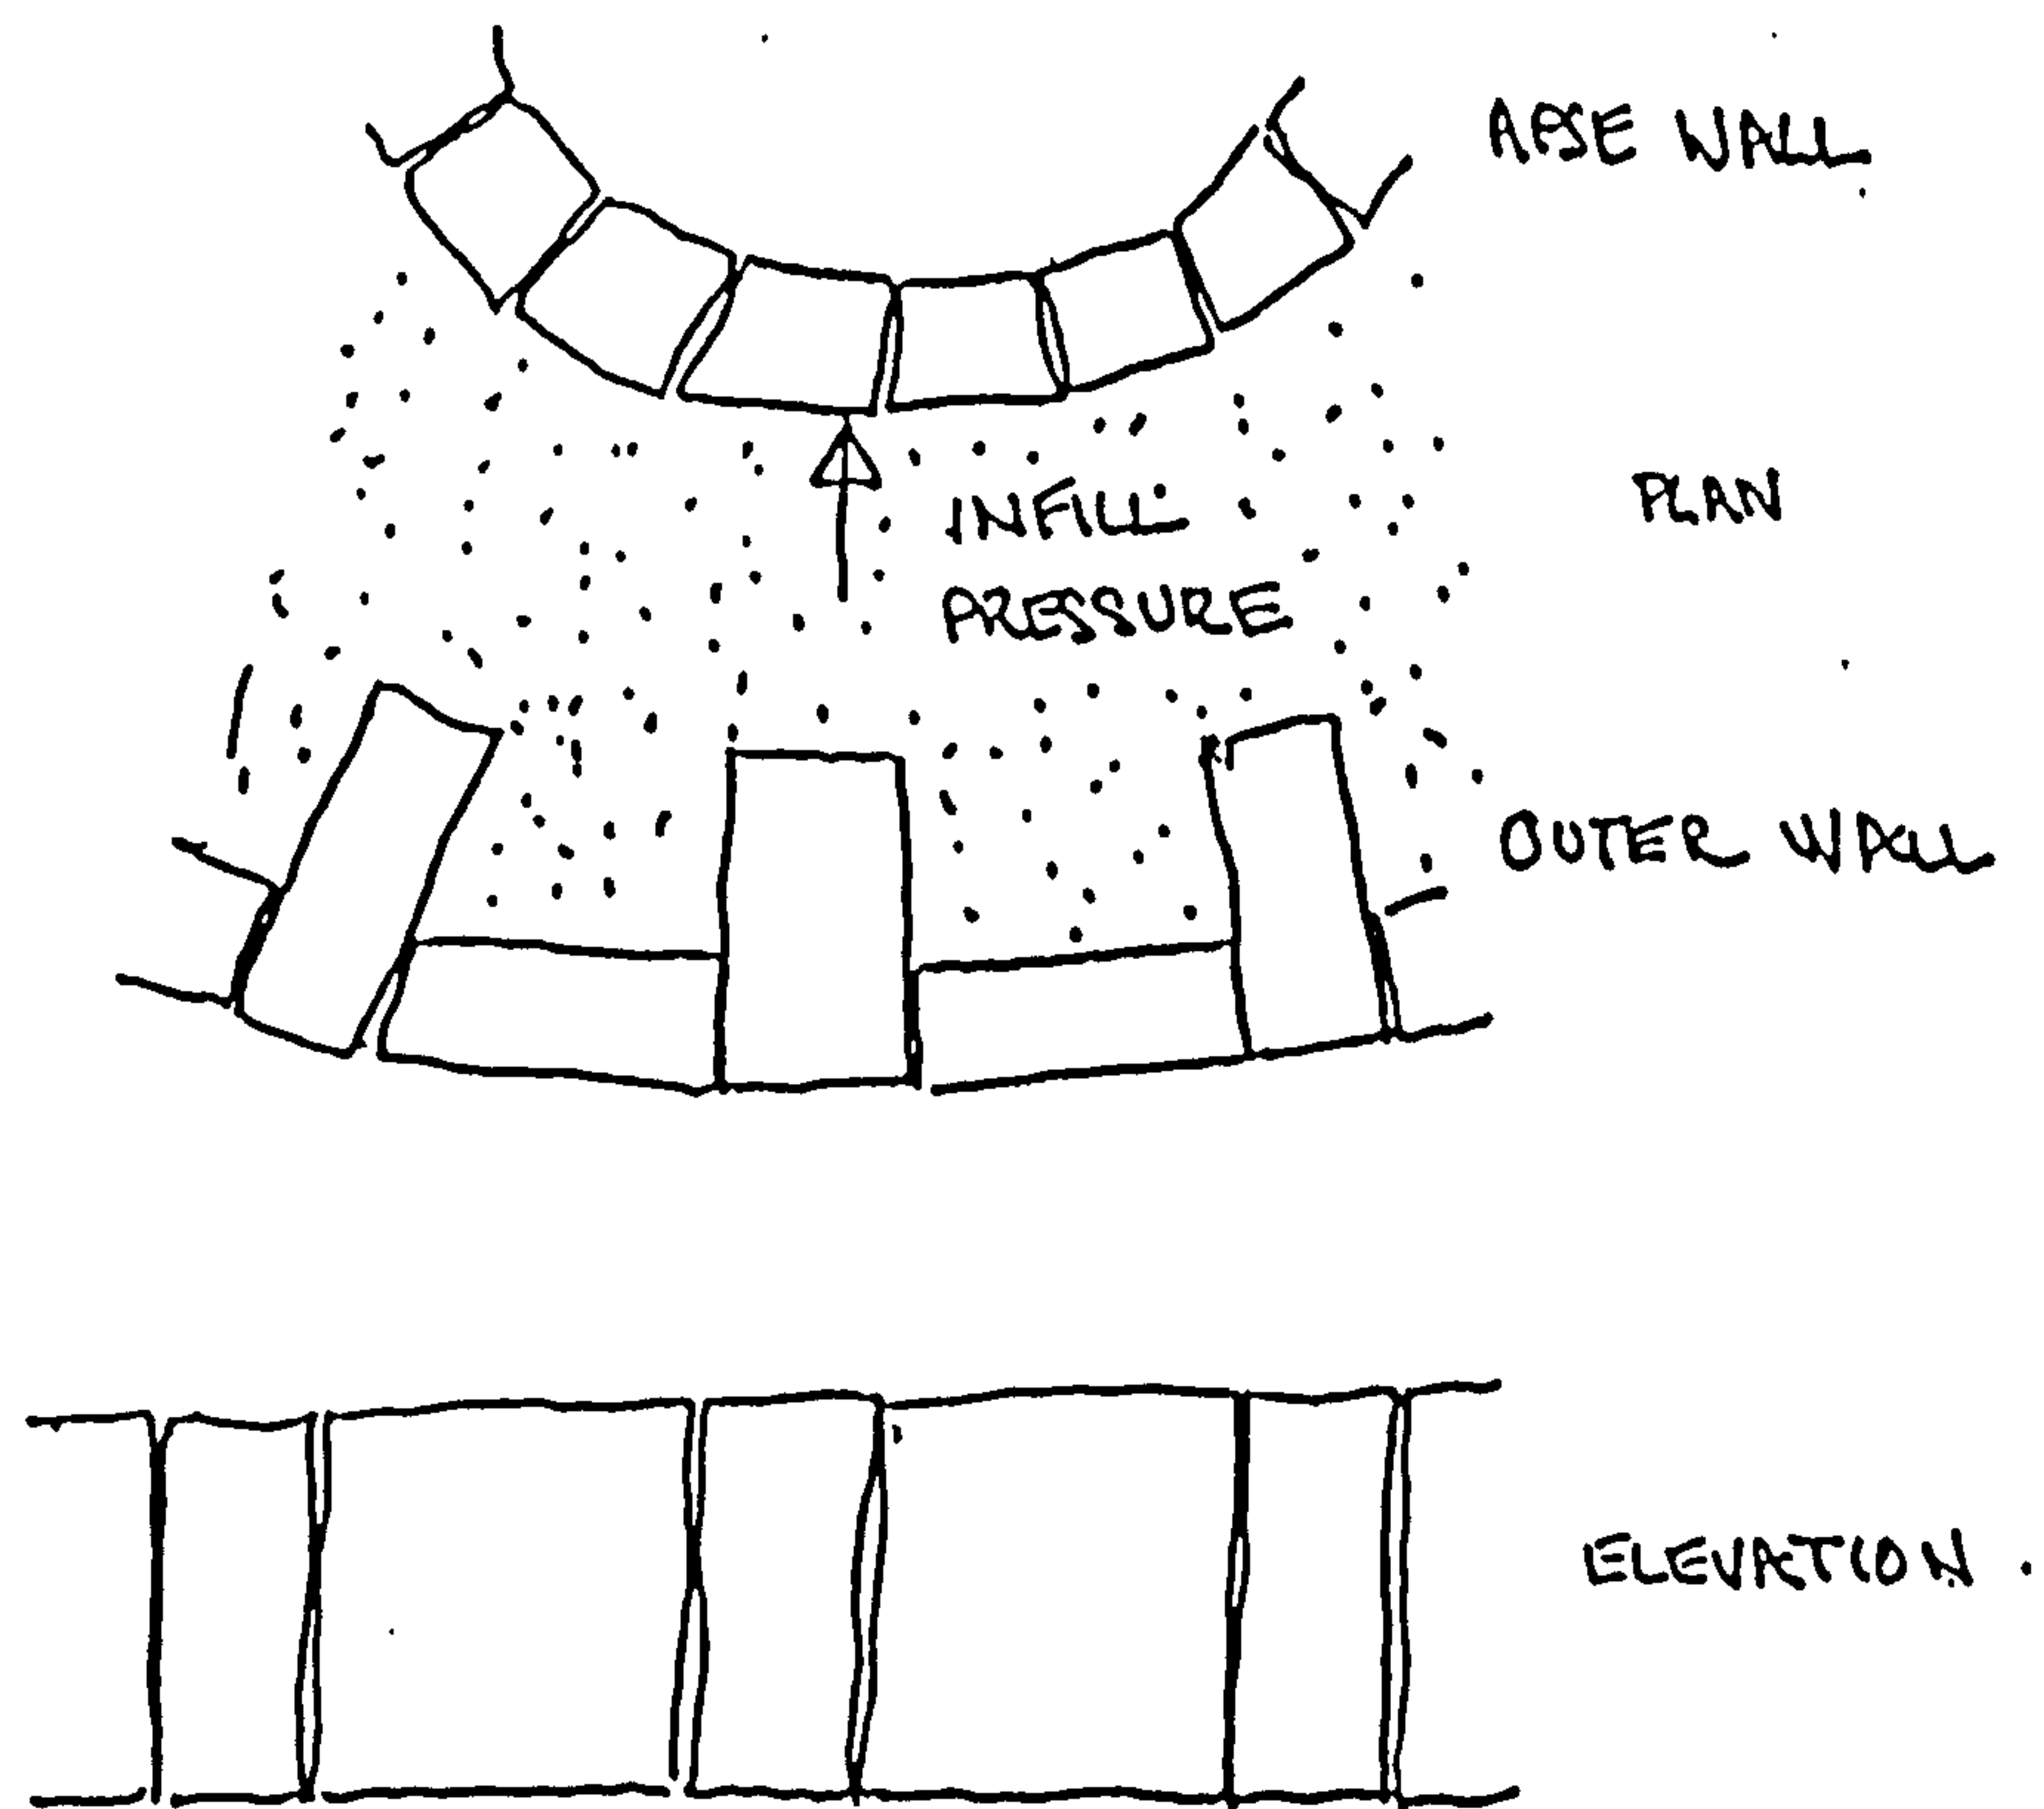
Schematic plan and elevation of inner and outer walls and infill.
